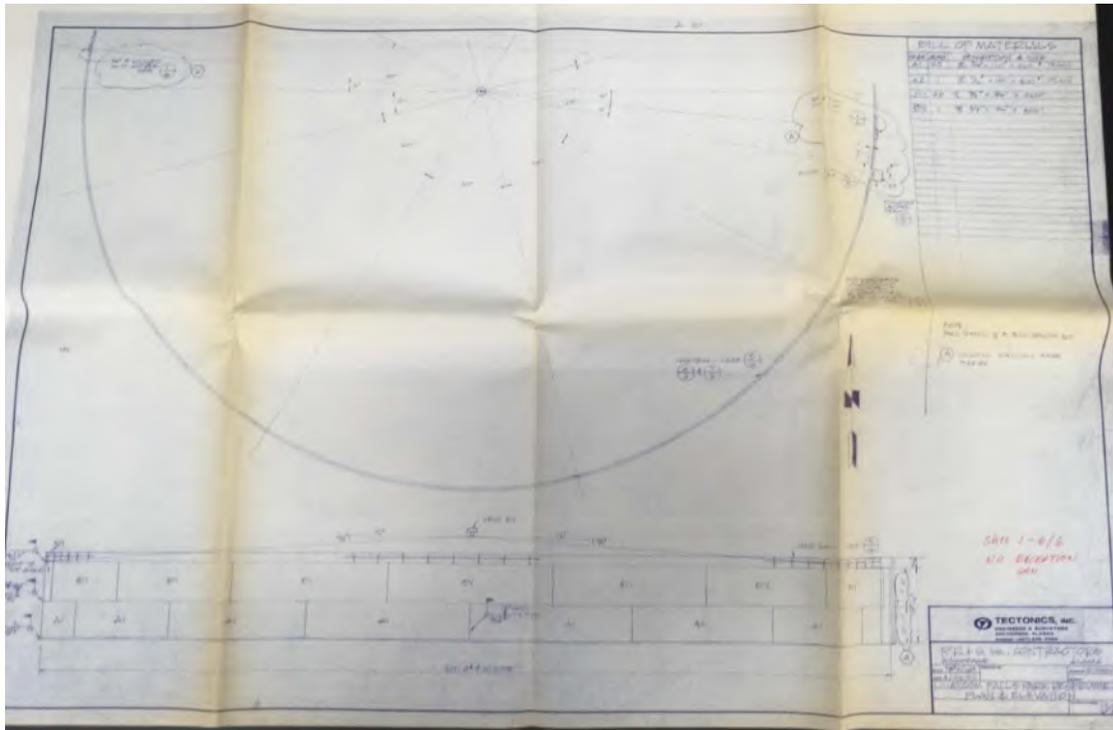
Whatcom Falls 1 – Plan and Elevation
